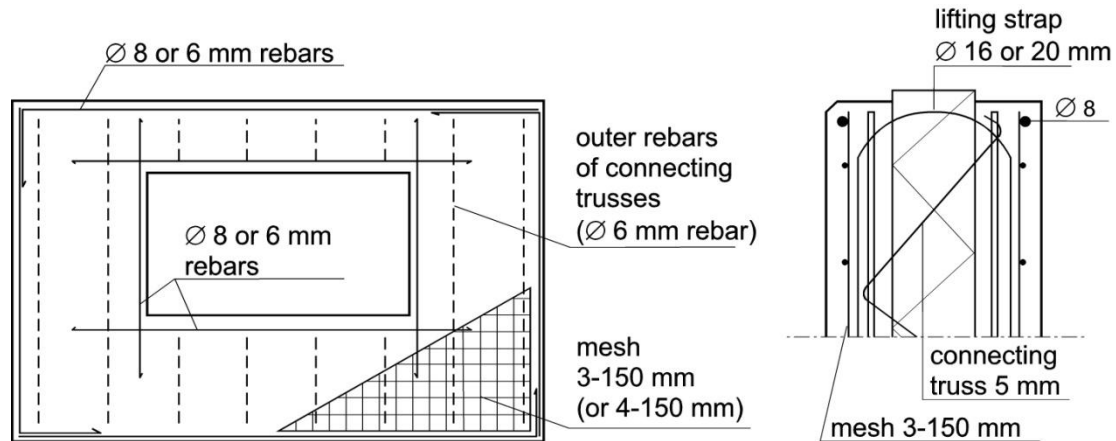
Typical reinforcement of outer layer of a concrete facade panel (Pentti et al. 1998).
